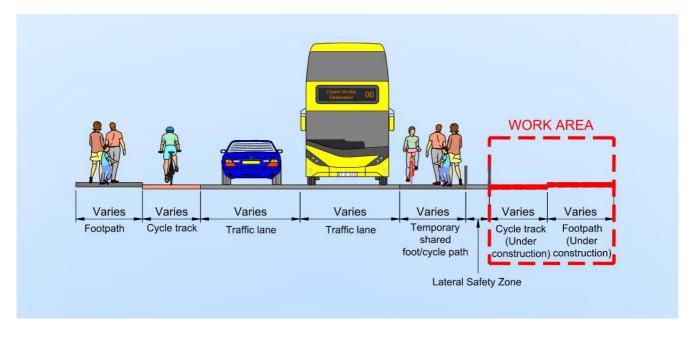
Traffic Management Cross Section, Section 3b Clanbrassil Street Upper / Lower - Stage 2
